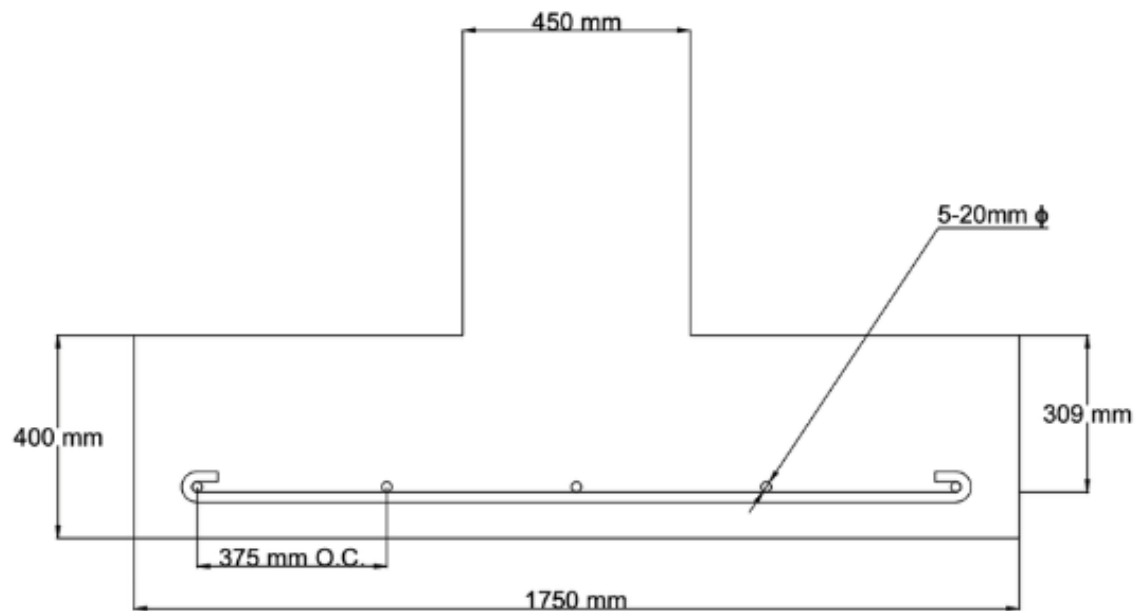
Cross-section View of Final Design of Isolated Square Footing
